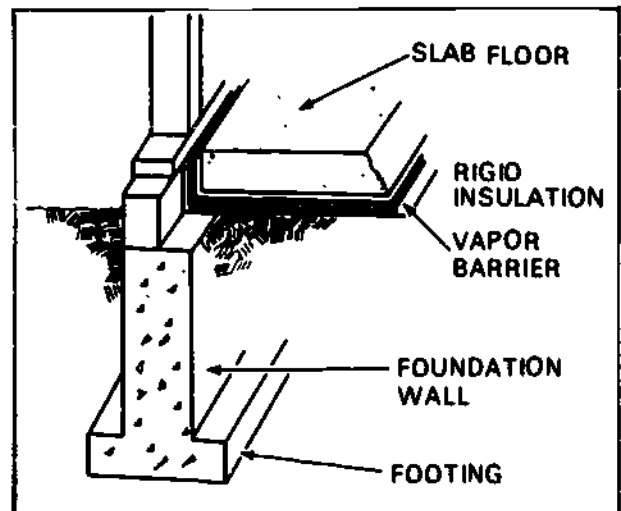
Rigid insulation must extend down to the frost line or 61 to 91 cm (2 to 3 ft) under the slab floor.
